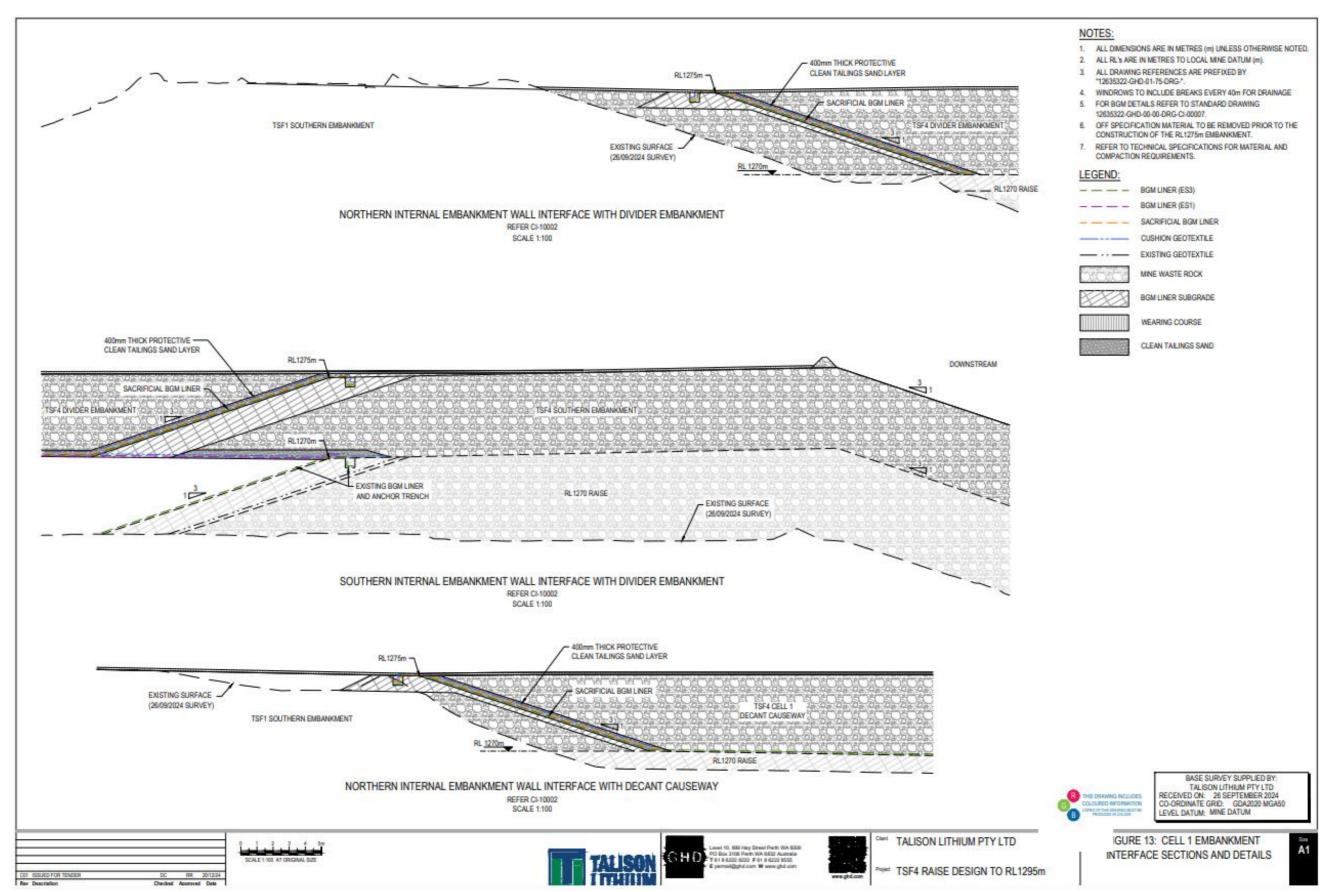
TSF embankment raise to 275 m AHD / 1275 m RL - Cell 1 typical embankment section detail - continued
